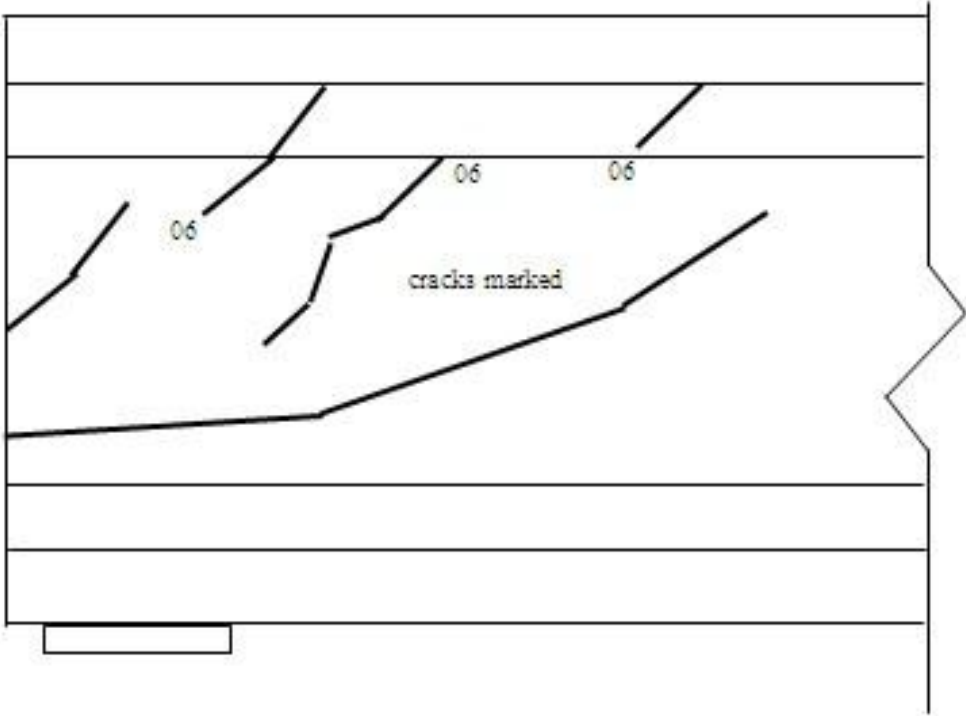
Crack diagram for exterior girder on west side, west face, north abutment (#1830).
